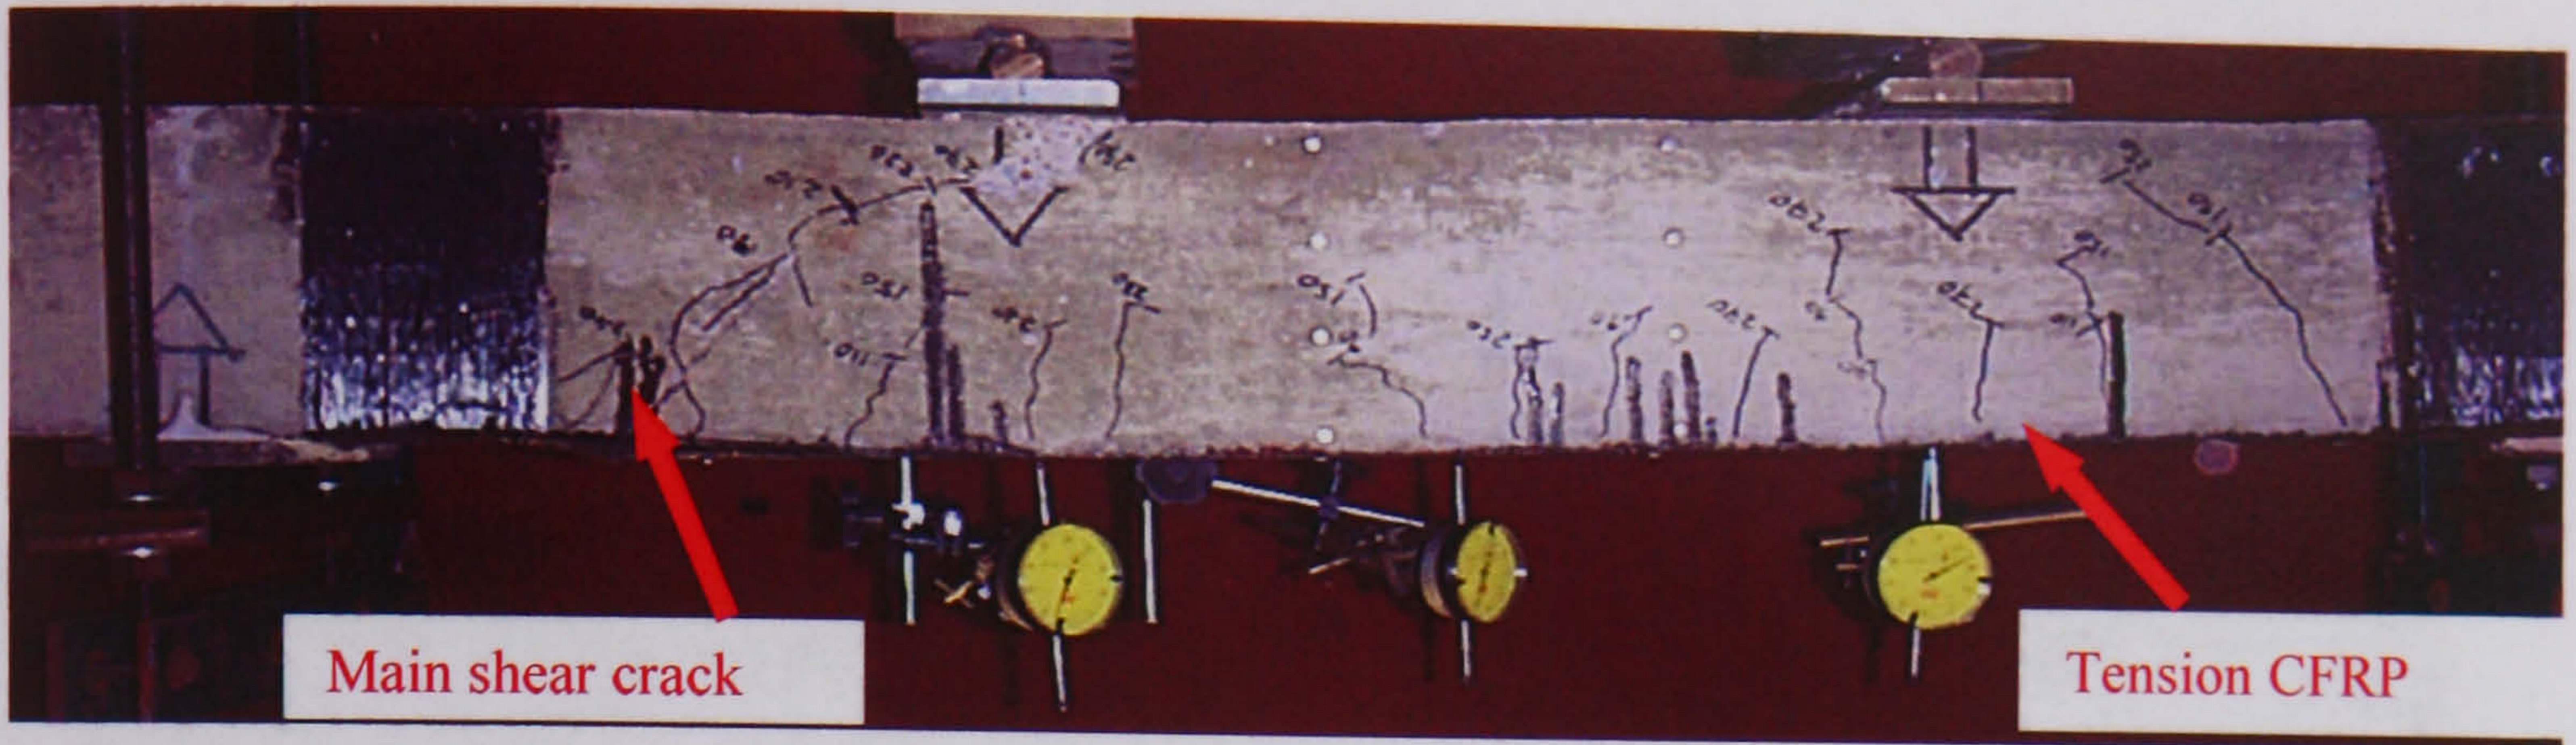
Shear failure in strengthened beam II2-UH-TC
